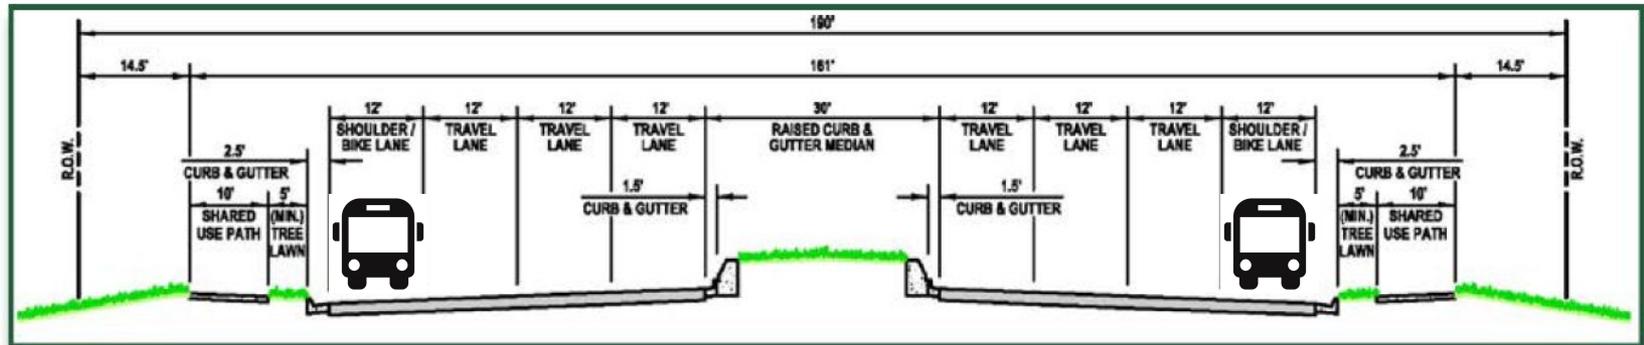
Segment 3 - Sheridan Parkway to York Street Cross-Section
